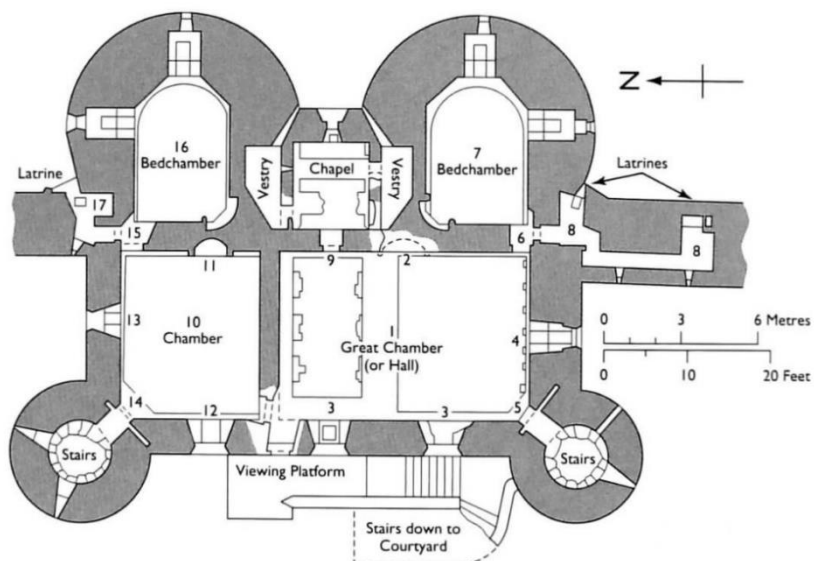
First-floor plan of the gatehouse at Harlech Castle, Merioneth, showing the central chapel/portcullis chamber
